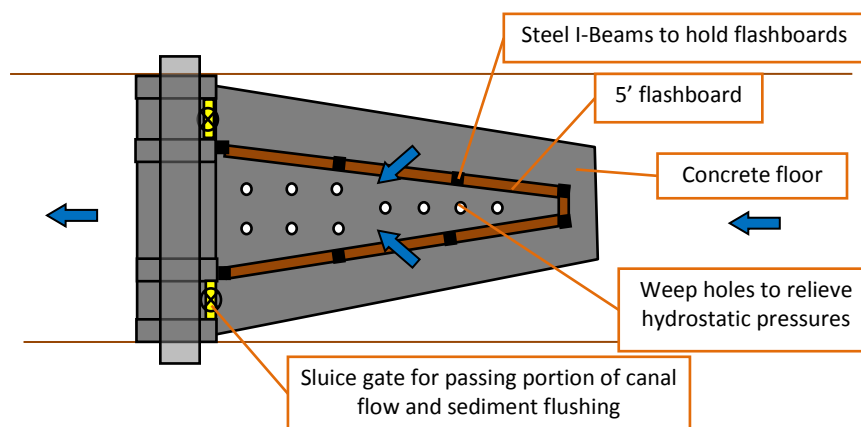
Example of a new LCW structure to be constructed along the MA Canal (not to scale)
